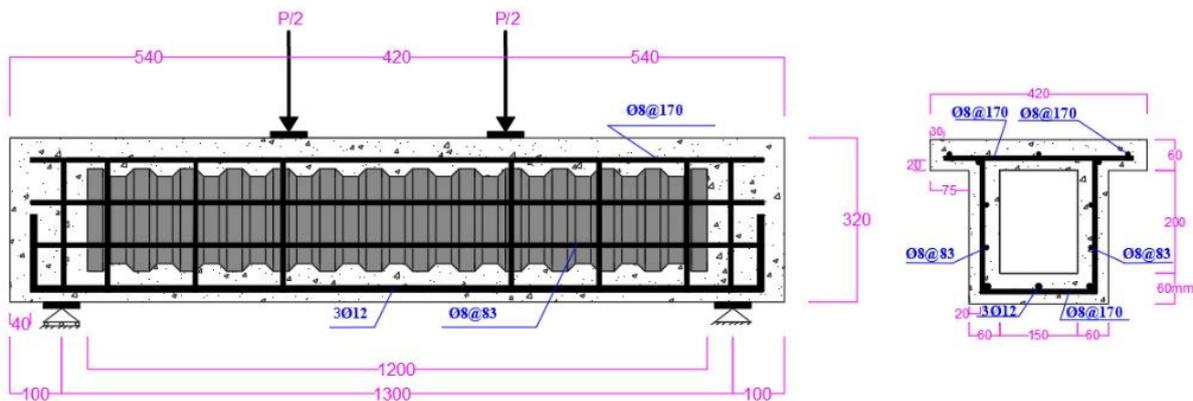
Dimensions and reinforcement details of (BSPSVC) (all units are in mm)
